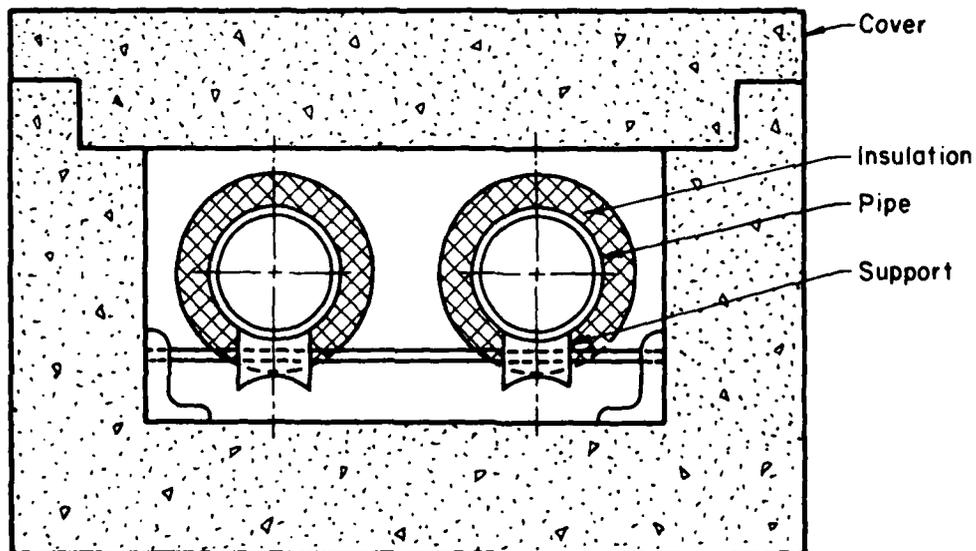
The shallow concrete trench (S-R) system, pipes supported on rollers or guides.
